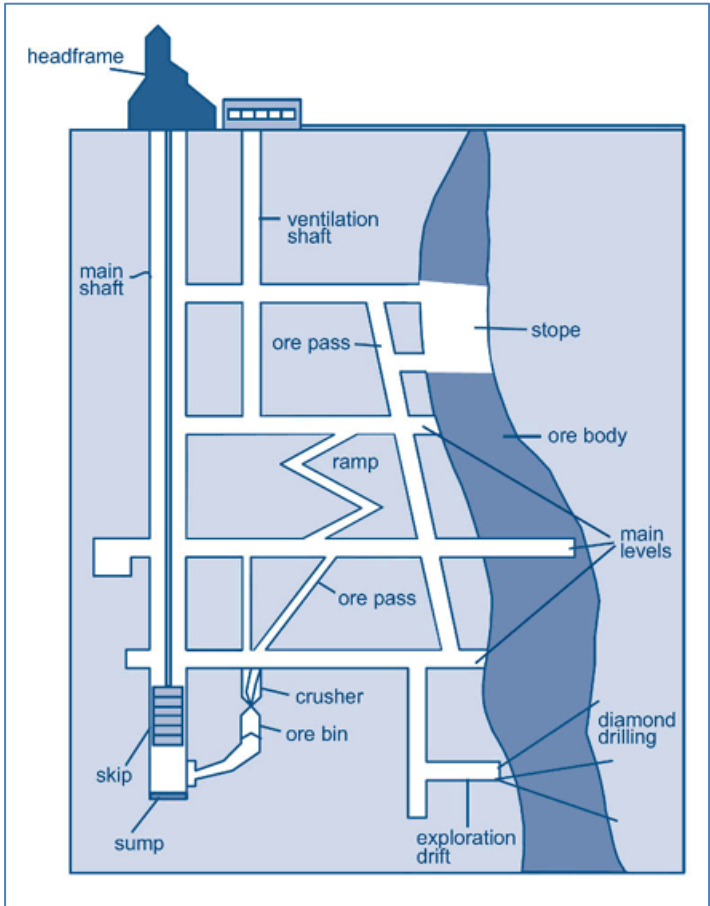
Cross-section of an underground mine (Environment Canada, 2009)
